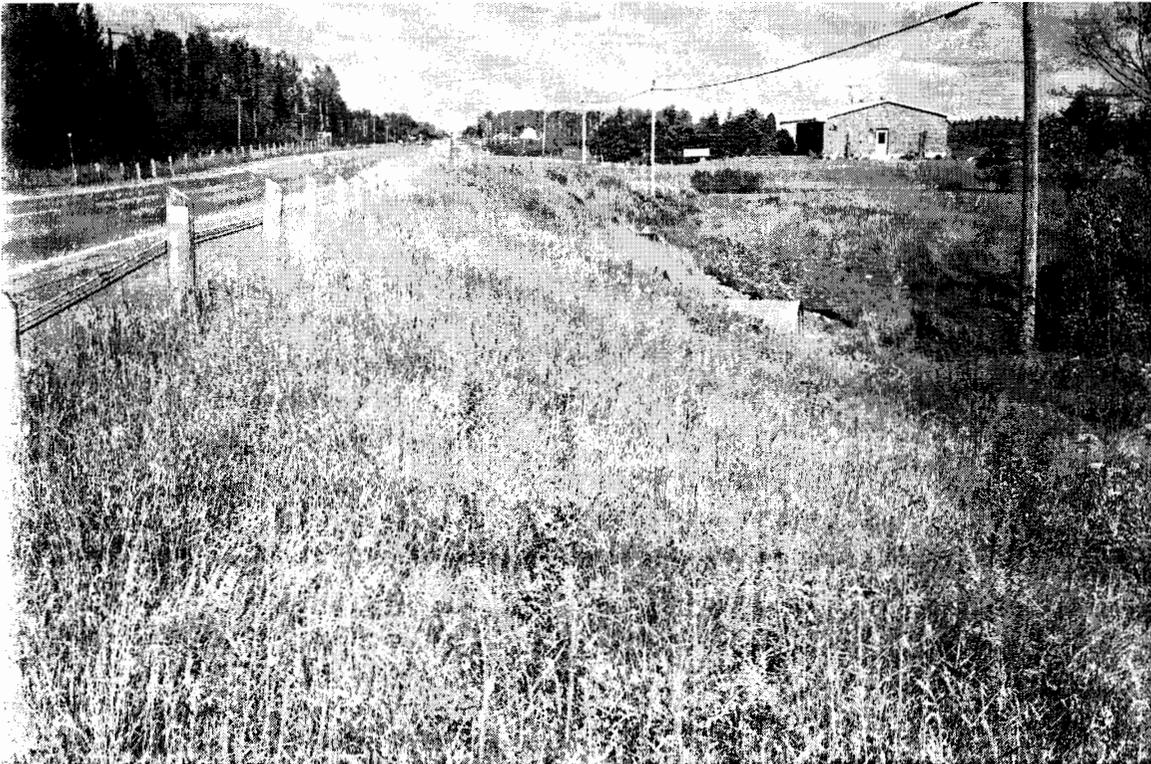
~ Station 11+407 – Looking east from top of the existing embankment at culvert outlet and creek gully.
